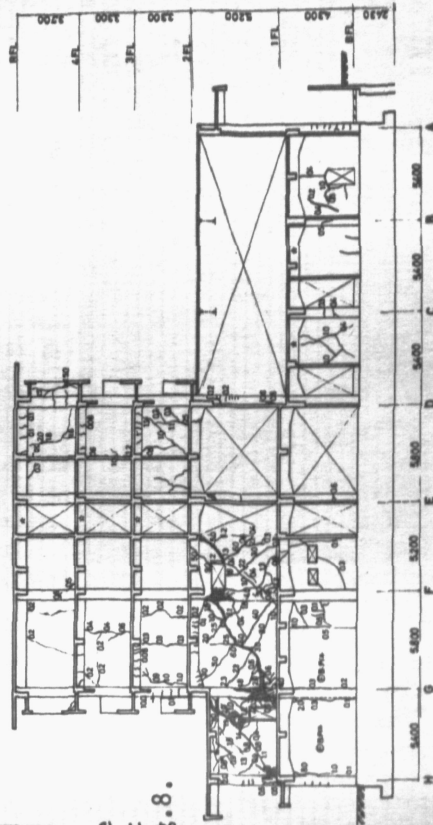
Structural Damage to Section D-D (West Elevation)
